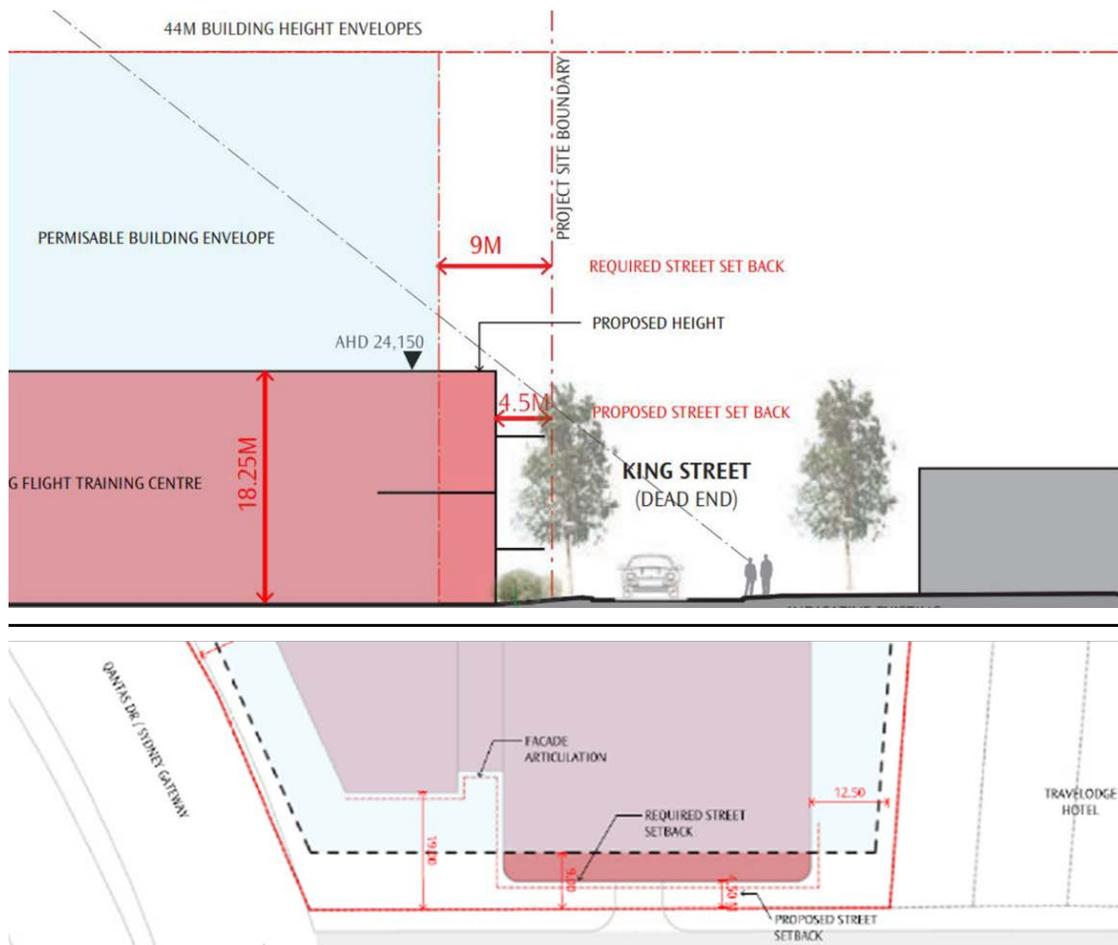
King Street setback and building height (top) King Street setback building layout (bottom) (base source Applicant's RtS)
